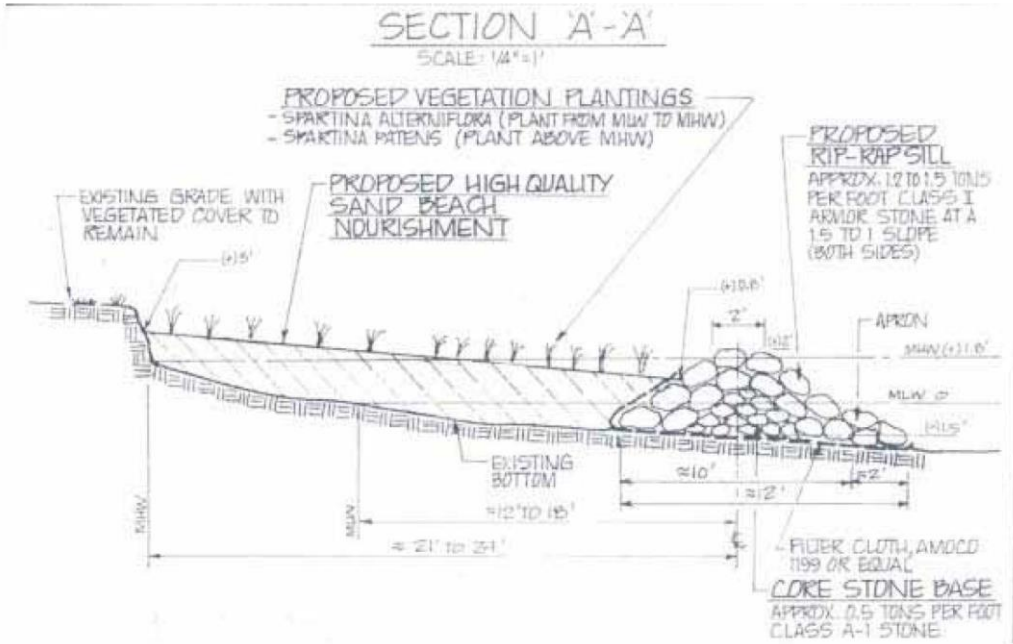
Typical cross-sections for sill built at Hull Springs Farm. Section locations are shown on Figure 1. Permit drawings by Bayshore Design, LLC.
